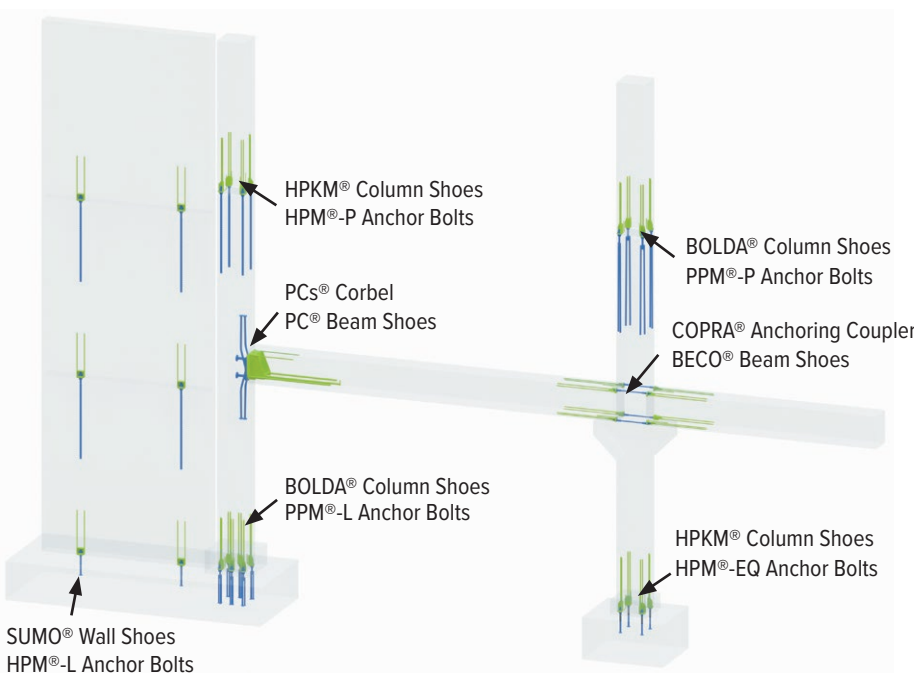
PEIKKO BOLTED CONNECTIONS IN PRECAST STRUCTURES
